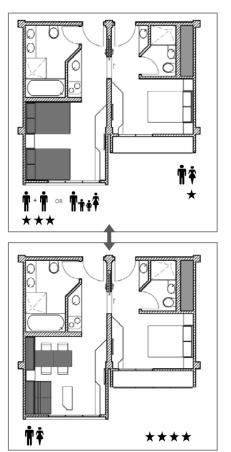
Diagram of a Typical Guestroom Floor showing the Location of Flexible 'Paired' Guestrooms
